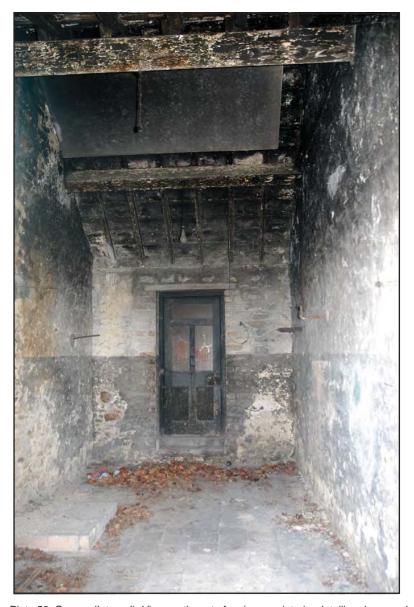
Garage (Internal): View northwest of main room interior detailing decor and usage: quarry tile floor, fireplace (?) plinth and roughcast walls. Rear door visible brick repair surround suggesting the door/entrance has been rebuilt or reused.
